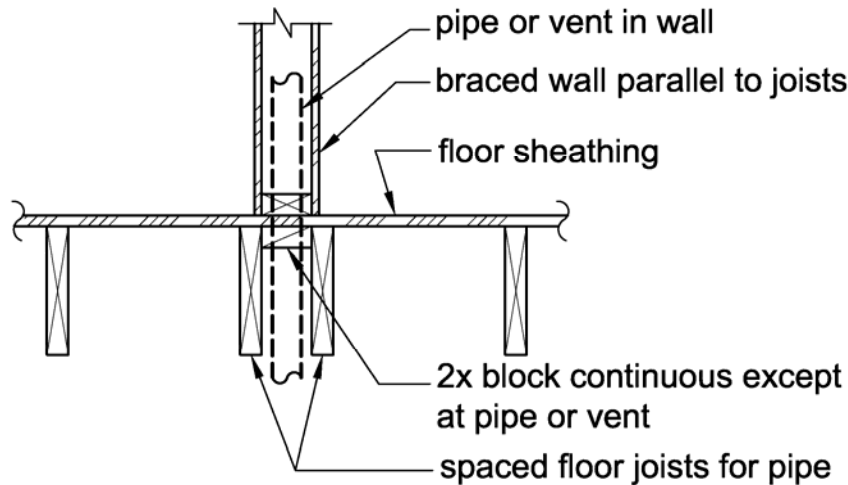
Blocking for floor joists spaced apart for piping in floor.
